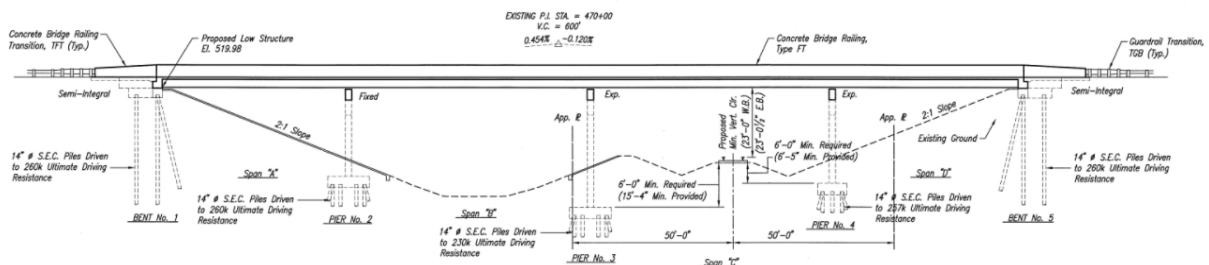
Elevation View of the Bridge (NBI 41230) (2015)
